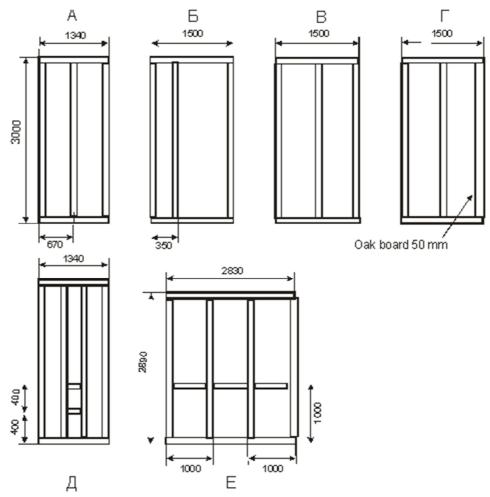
Sketches of frames for preparing of walls, ceiling and door of camera.
